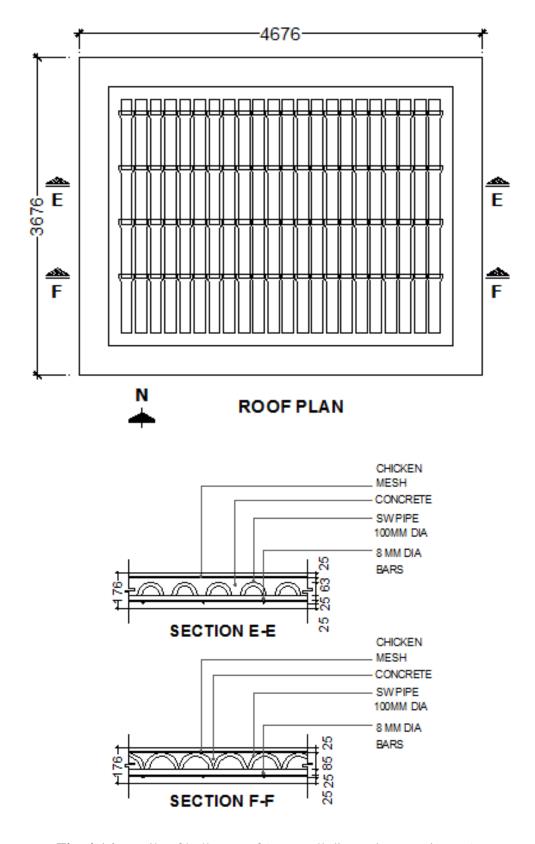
Details of hollow roof (Note: all dimensions are in mm)
